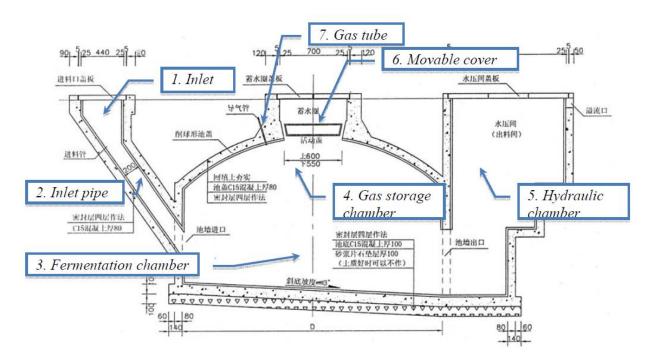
Typical design of a household biogas digester installed under the proposed PoA.
